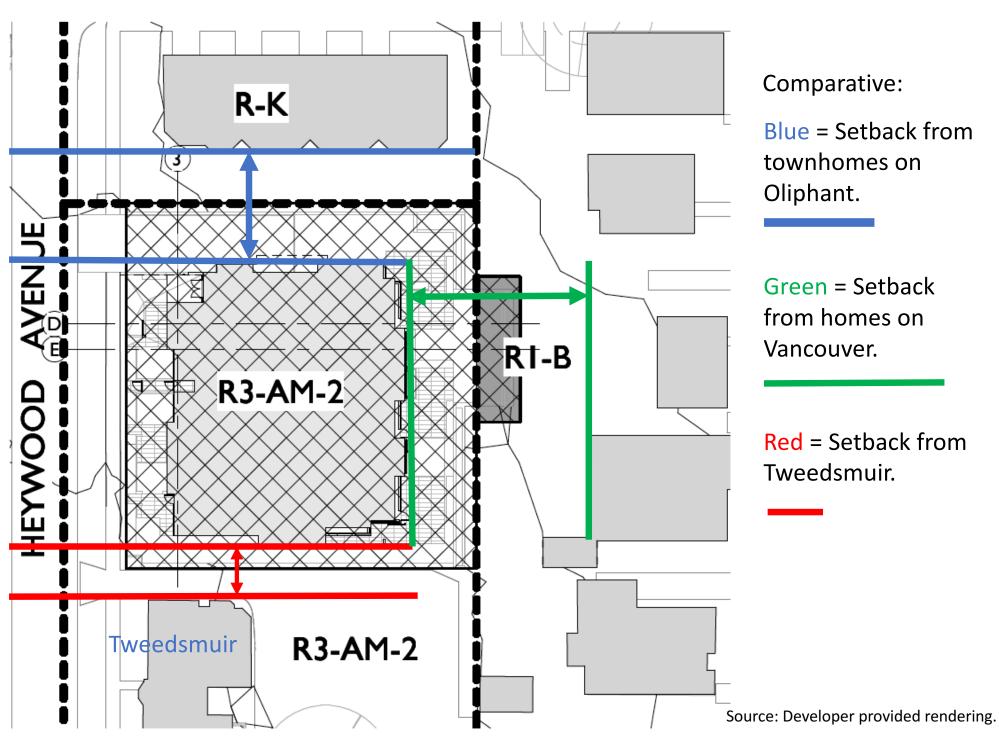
Overhead view of proposed development with setbacks from existing buildings.
